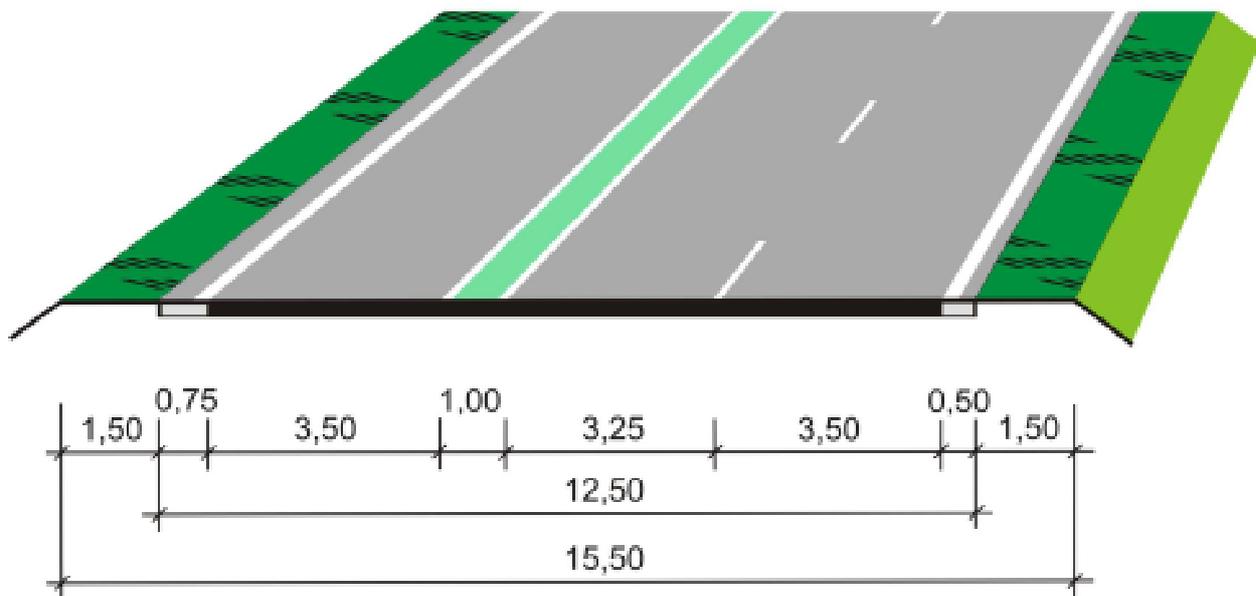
RQ 15,5 according to new guidelines for the design of rural roads currently being developed (RAL, FGSV, 2007)
